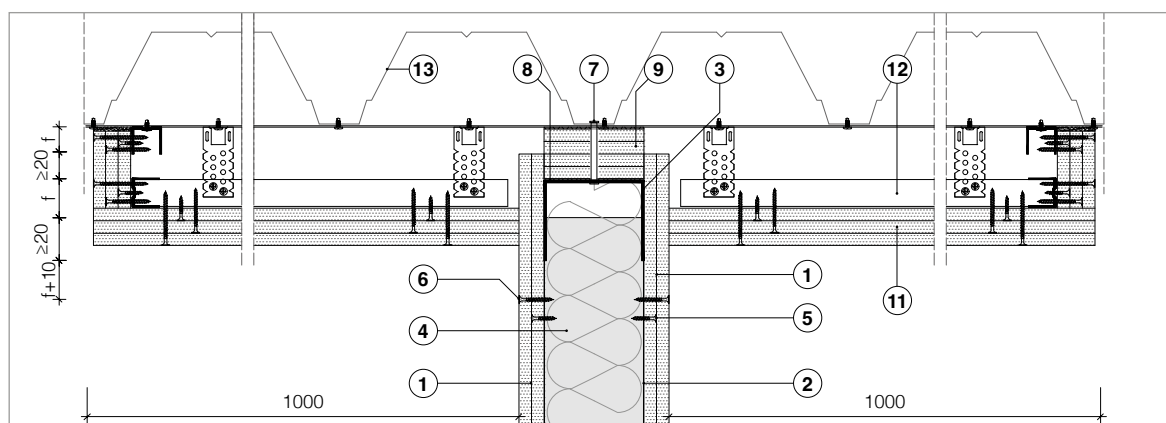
Connecting a wall with a ceiling with combustible covering – the use of suspended ceiling or lining
